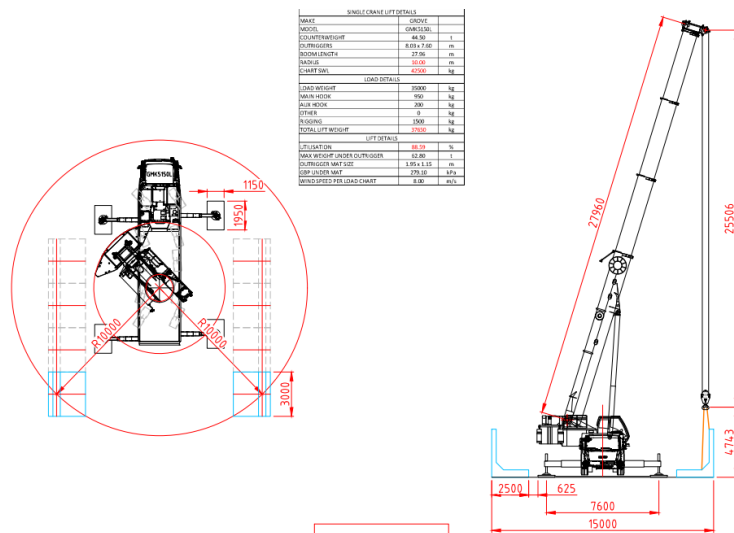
TYPICAL CRANE LAYOUT FOR PANEL ERECTION
